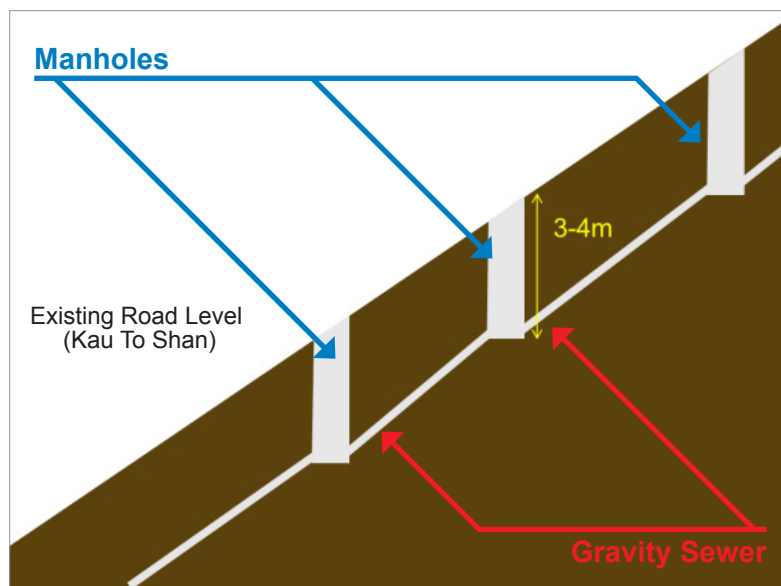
Schematic Diagram for Alternative Design of Sewers at Slopy Location
